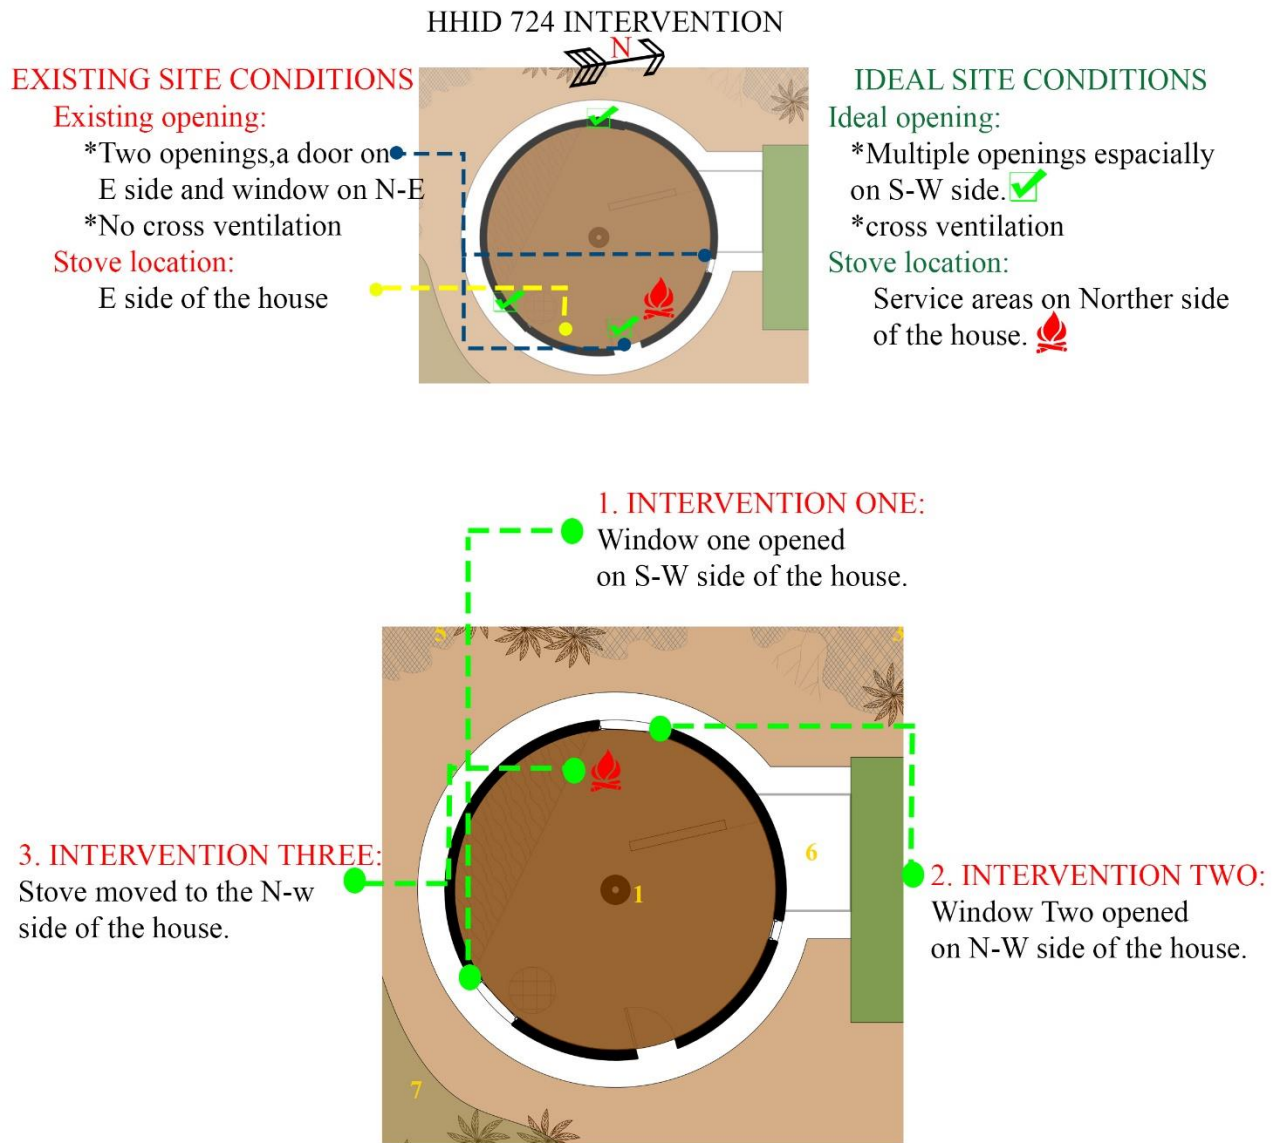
Experimental House No.2 Floor plan and section view with pre and post intervention diagrams
